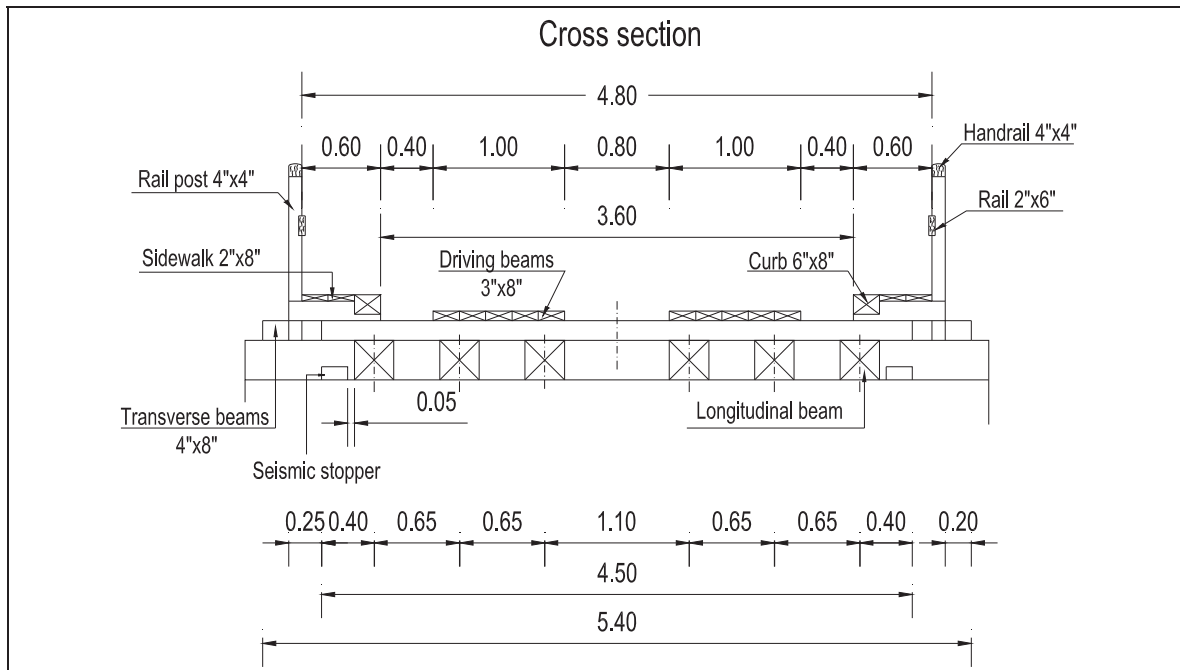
Cross section of a standard Chilean timber bridge [3]
